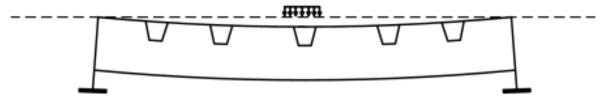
Structural system 4 (Håkansson & Wallerman, 2015)
